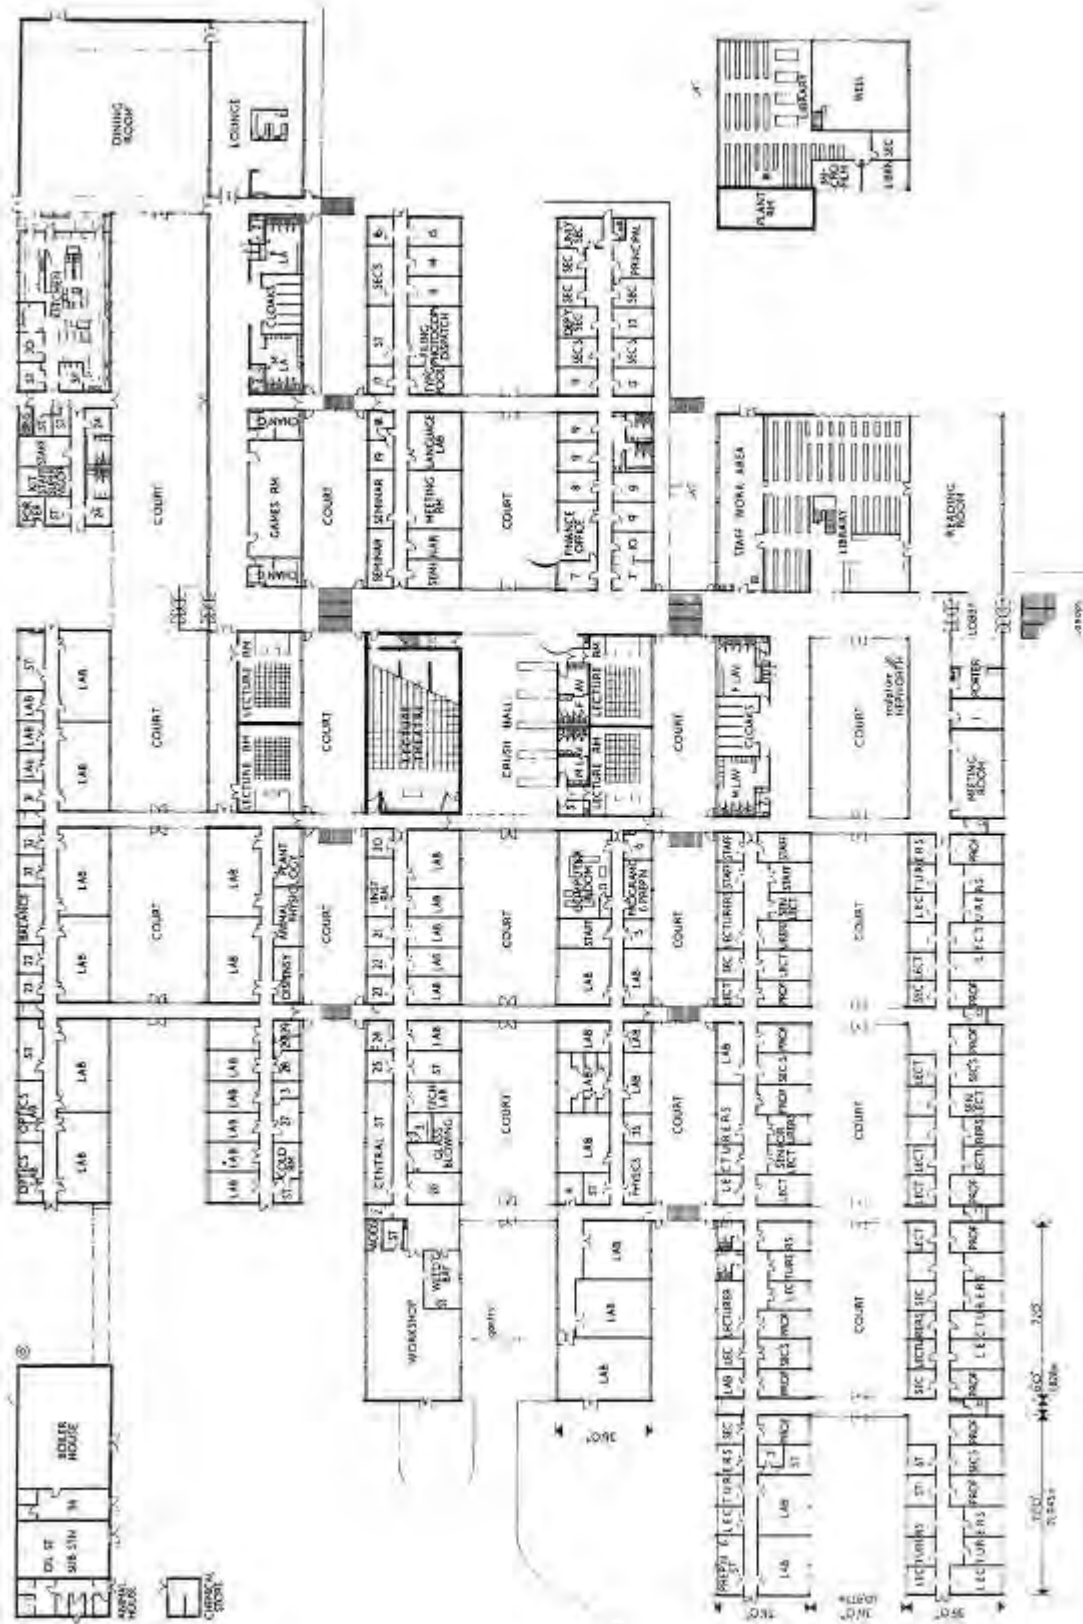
Plan of Pathfoot shortly after opening. Architects' Journal
